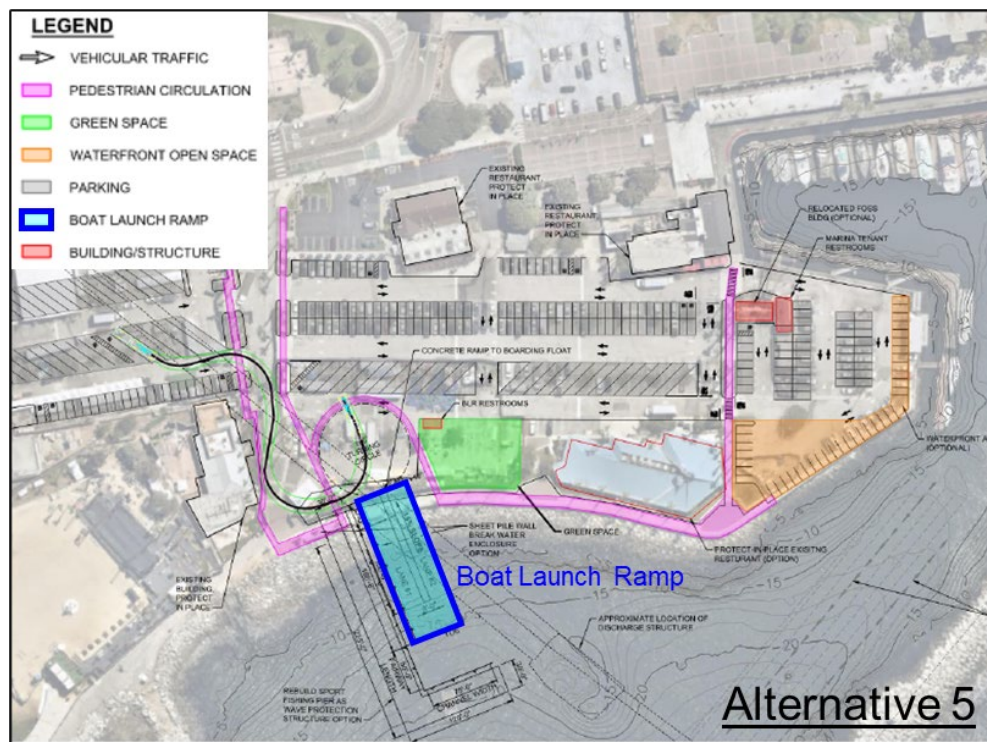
Boat Launch Ramp Placement – Alternative 5 (Note: The graphic shows a rebuilt pier and potential sheet pile wall wave attenuator, but the wave modeling assumed no pier or wave attenuator) (dated December 18, 2024).
